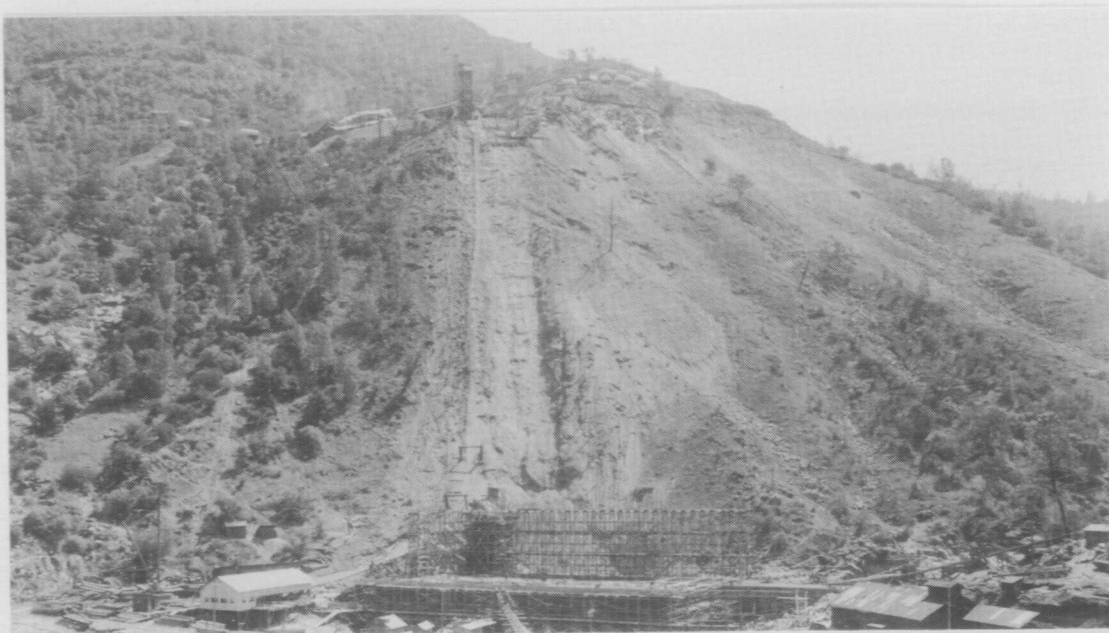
Powerhouse No. 3 under construction, April 1923 (SCE
